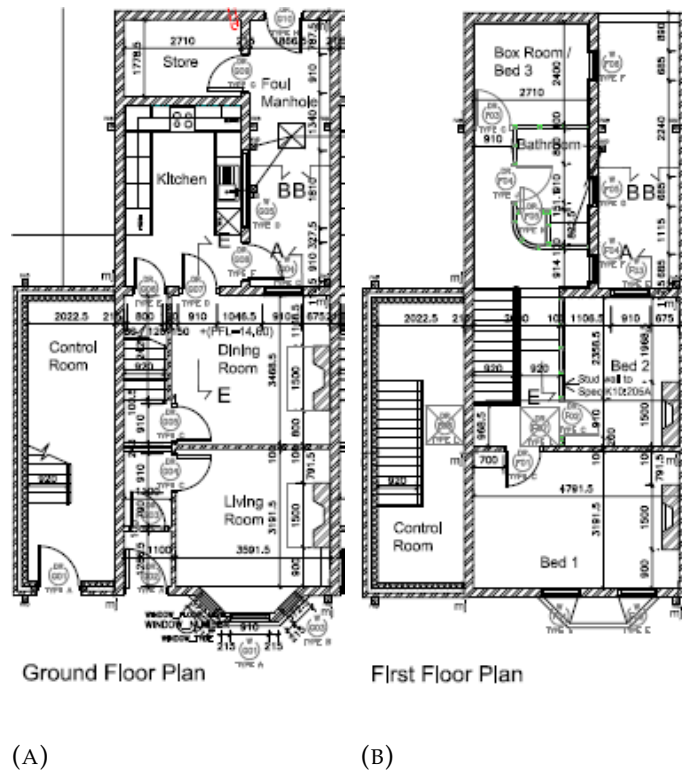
Layout of the investigated house (House 64 in Figure 2.2): (a) Ground floor; (b) first floor.
